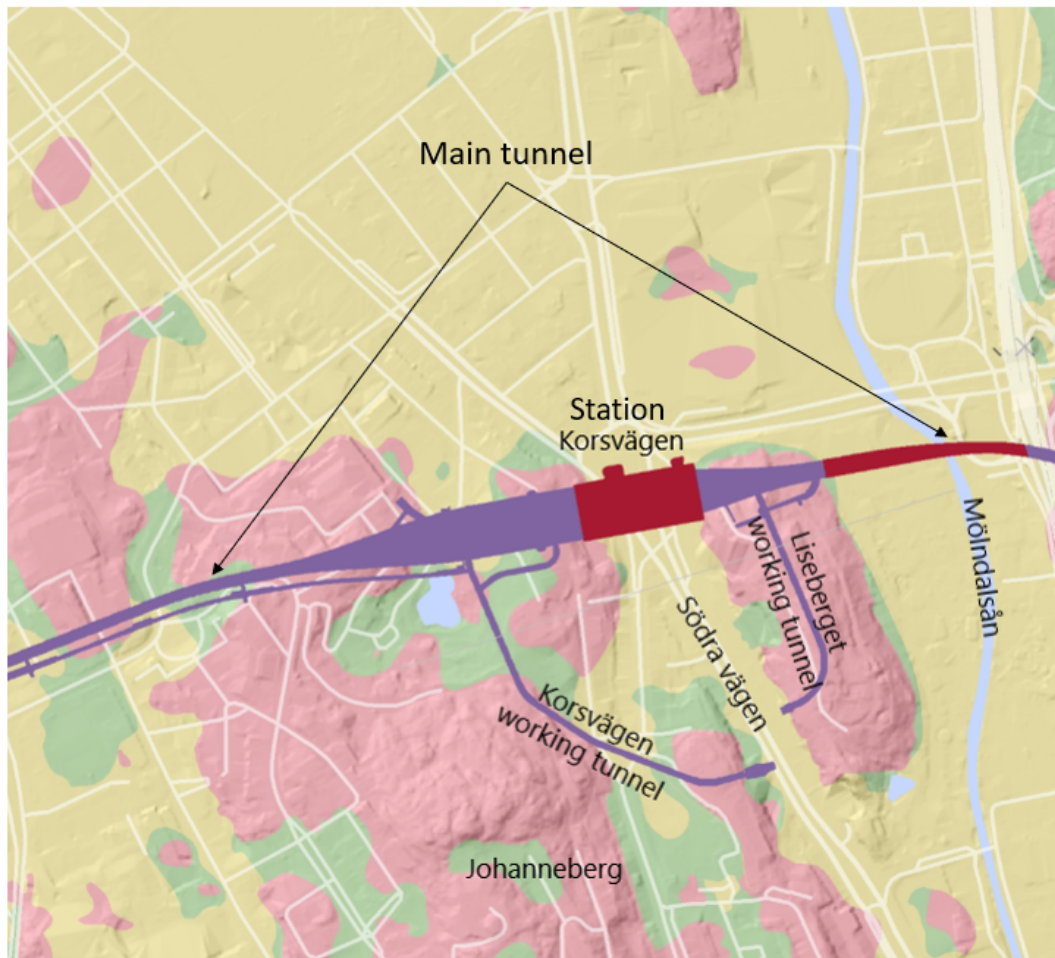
Location of tunnels, red=concrete tunnel, purple=rock tunnel, pink=rock outcrop, yellow=cohesive soil, green=frictional soil (Sundkvist & Wallroth, 2016). Adapted with permission.
